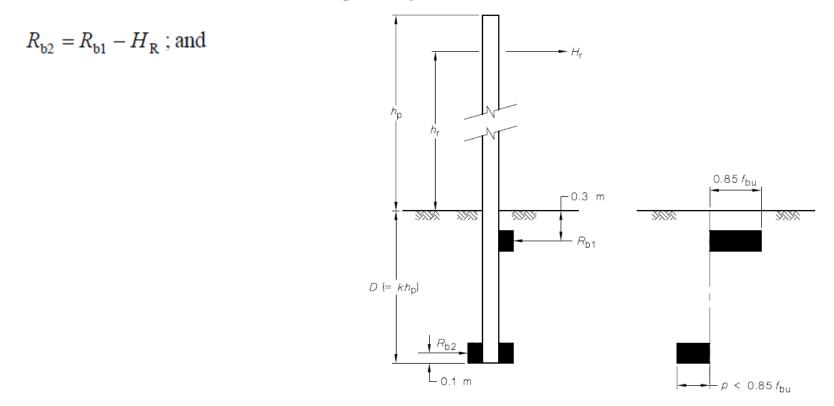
FORCES ON FOOTINGS AND FOUNDATIONS (FIXED EMBEDMENT)
